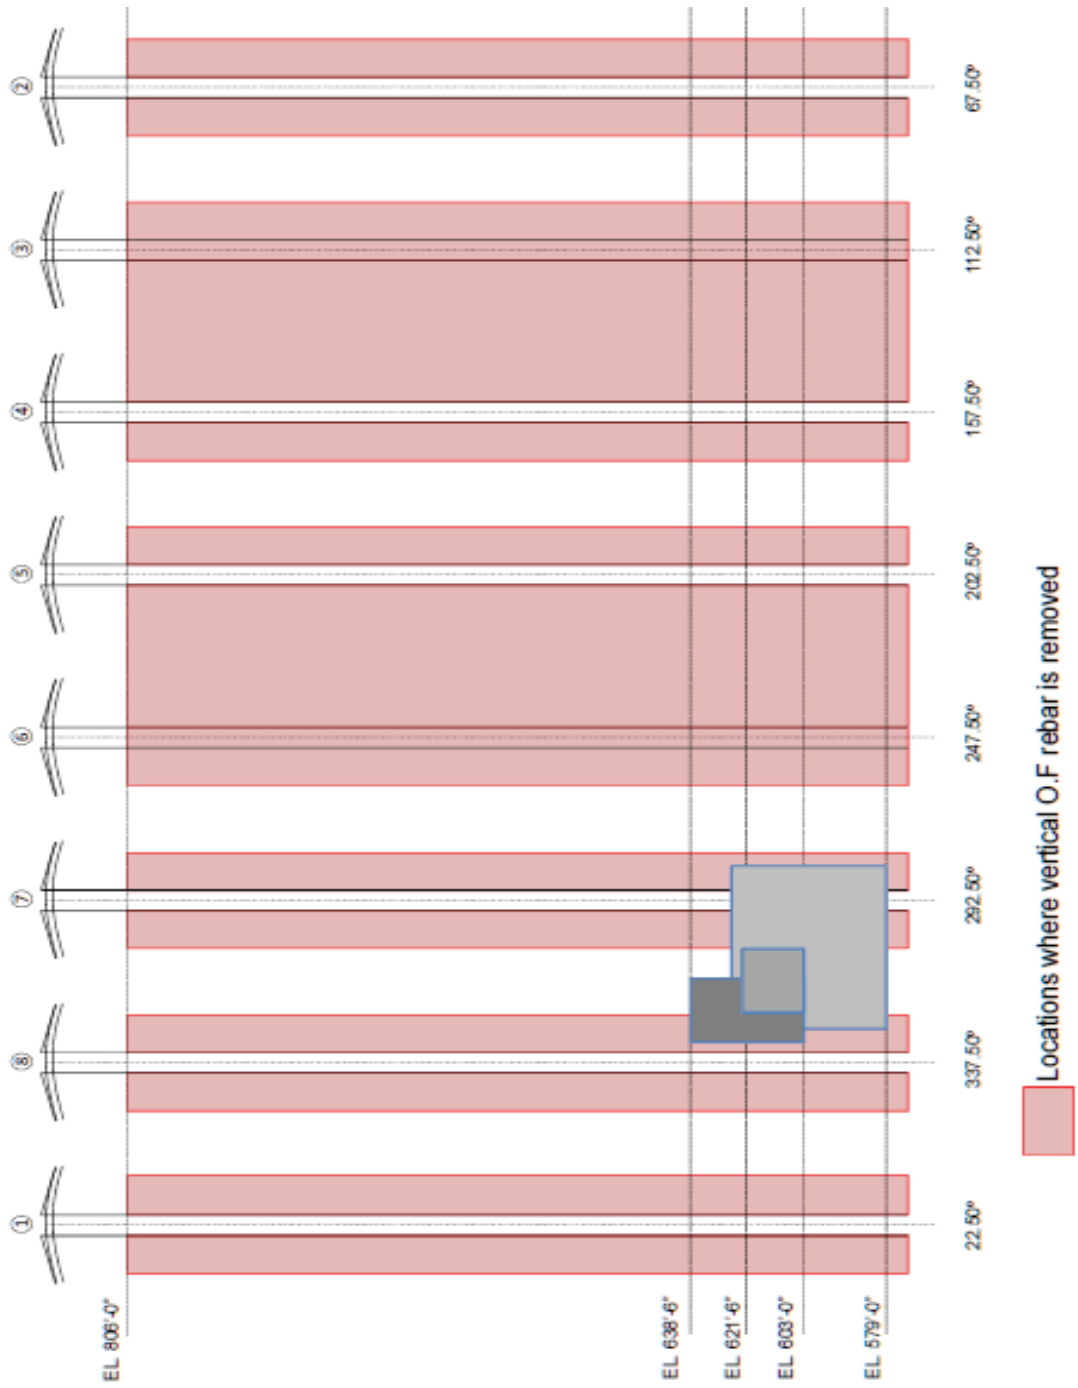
Location where vertical O.F. rebar is removed – Part 1 of 2
